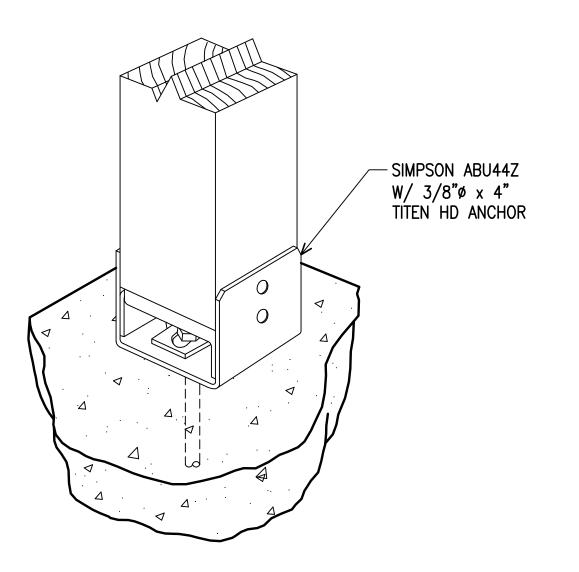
1/2" = 1'-0" EXISTING WOOD FRAMING
